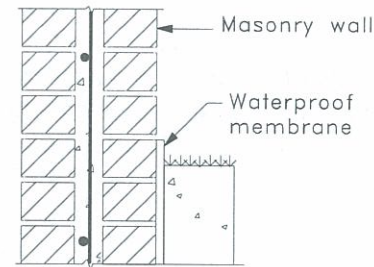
Planter box details. Planter boxes attached to wood framed structures are required to have a clearance of not less than 2 inches [50.8 mm] from the face of the wall, whether of stucco, wood siding, wood sheathing or wood studs.
